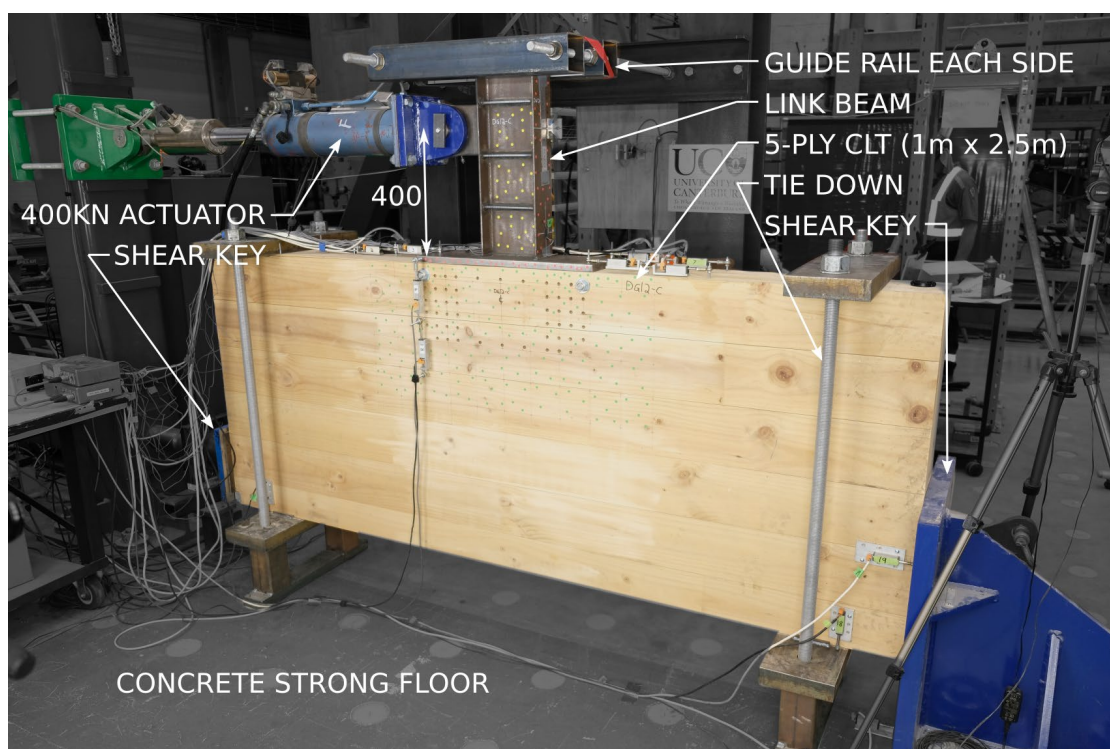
Experimental setup for cyclic testing of steel link beam and SDD connection to CLT wall.
